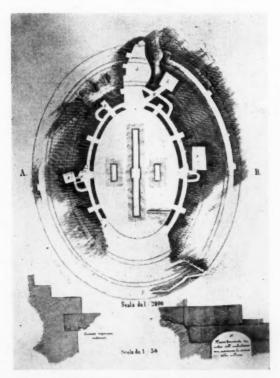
Plan and Architectural Details by V. Crespi, 1887
